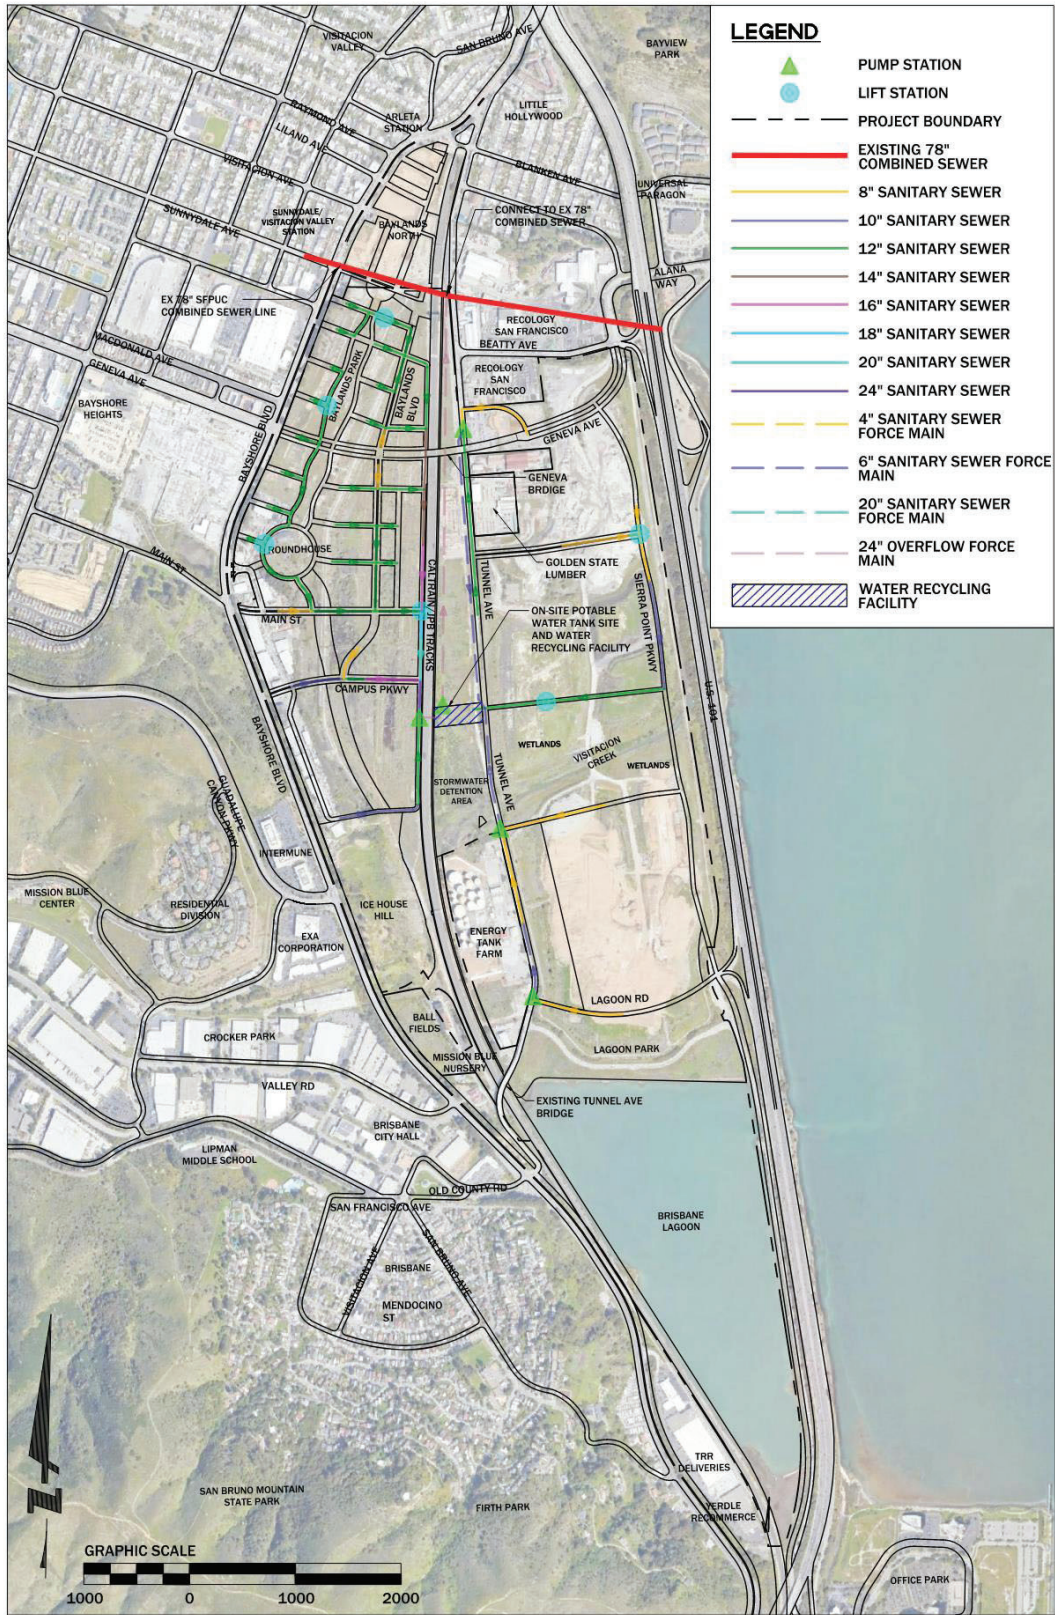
PROPOSED WASTE WATER SYSTEM IMPROVEMENTS
